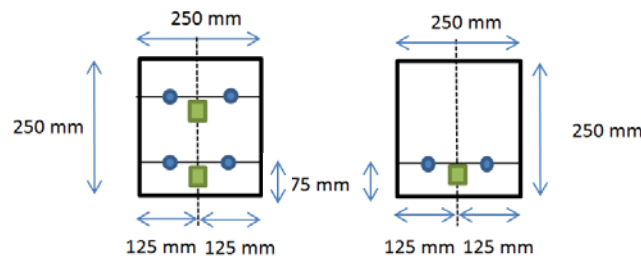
Instrumentation configurations at the cross-sections (Left: beam, Right: column)
